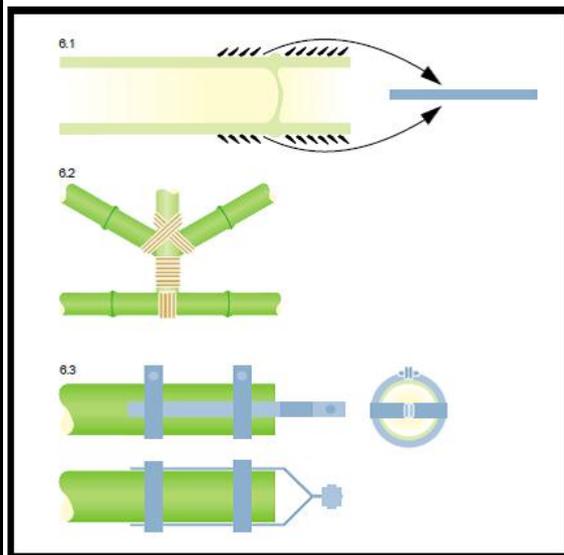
Joints from outside to element parallel (Janssen, 1981).
